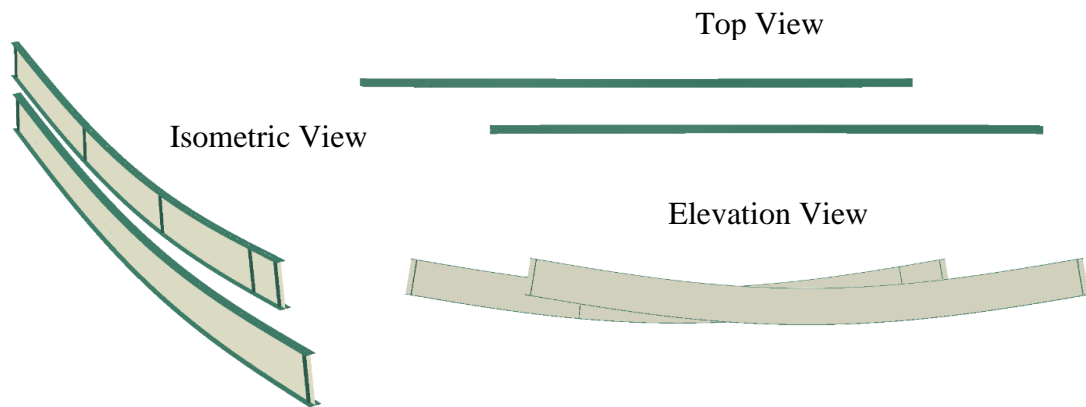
Magnified girder deflections for two straight I-girders, simply-supported at their ends on skewed bearing lines, and subjected to the self-weight of the structural steel prior to interconnecting the girders by the cross-frames (cross-frames not shown).
